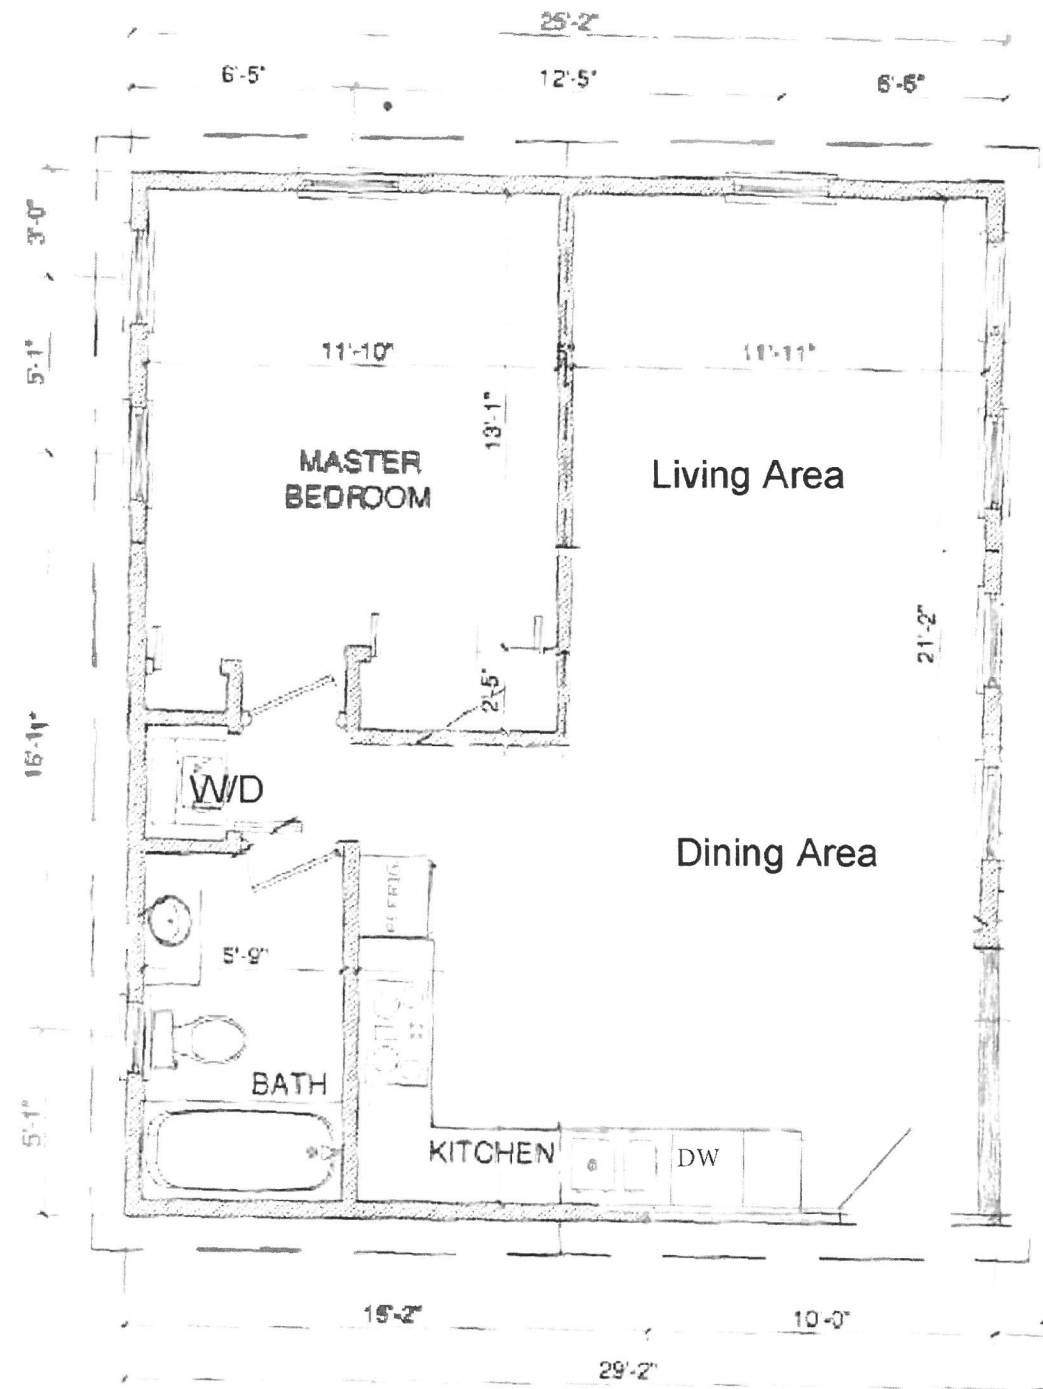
Bahama StreetBPAS Application – Minor Renovation
